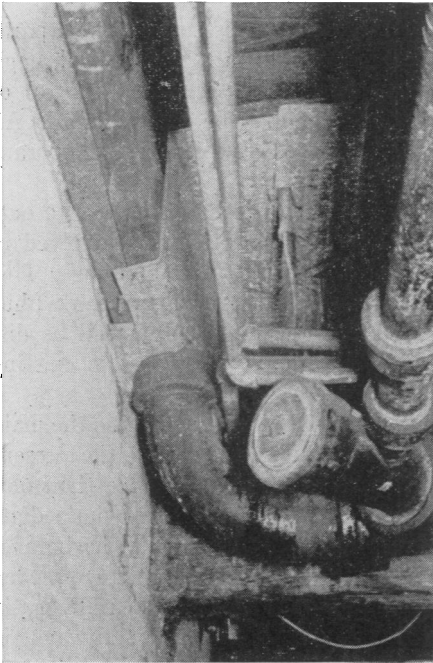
Rat proofing as applied to pipes. Galvanized metal installed around pipes to prevent rats from gaining entrance to upper floors.
